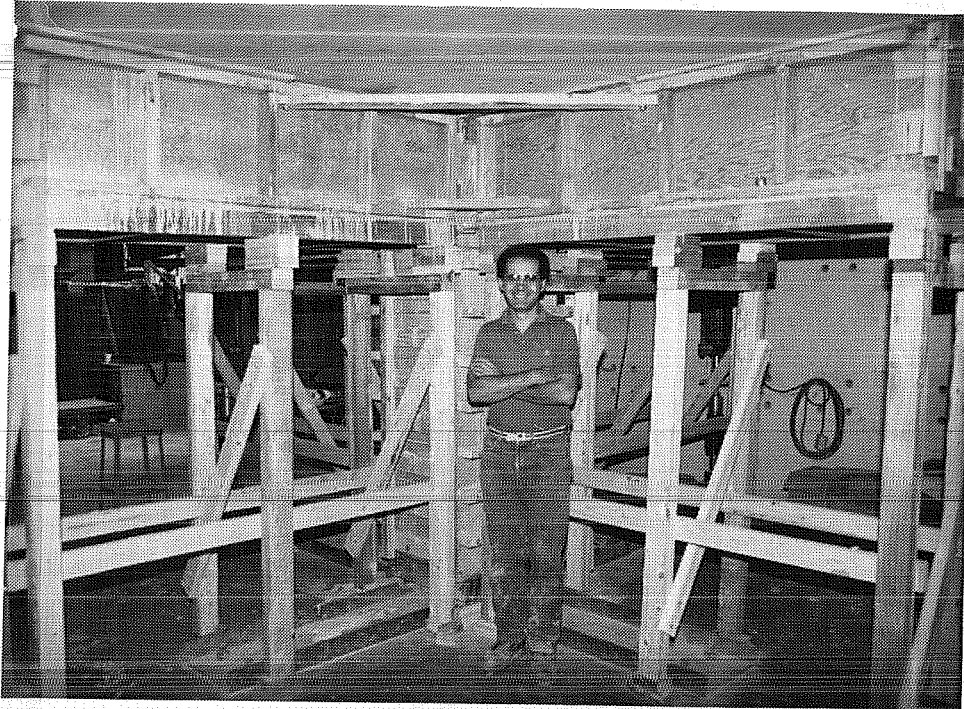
Specimen SD-B - Formwork Beam Jacket
